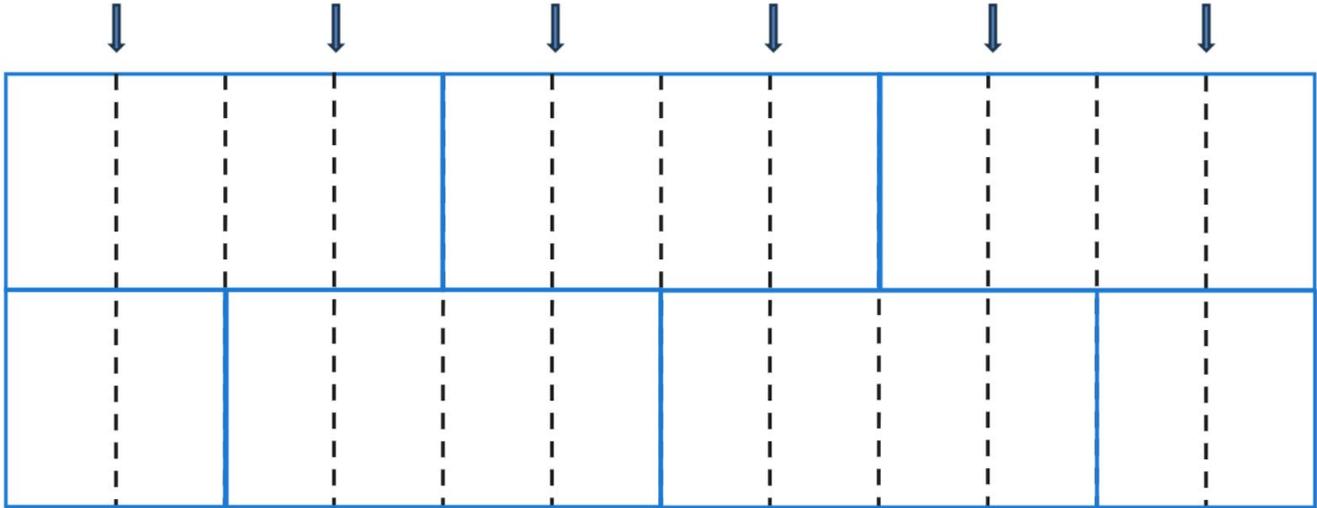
Simple Beam Diaphragm Configuration For Load Applied Parallel To Joists
